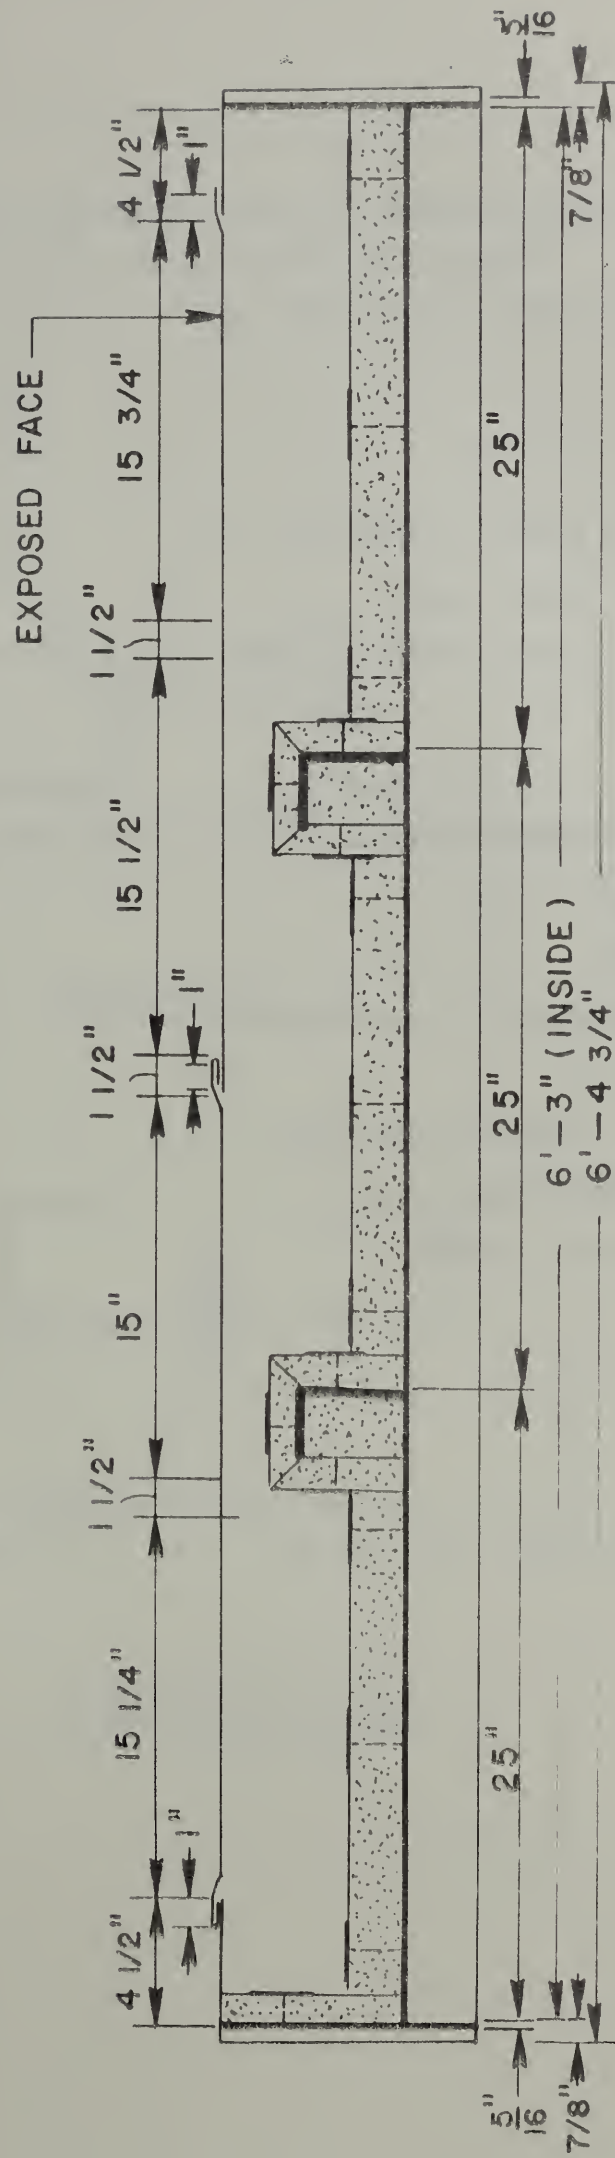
HORIZONTAL CROSS SECTION OF ASSEMBLY 3F
